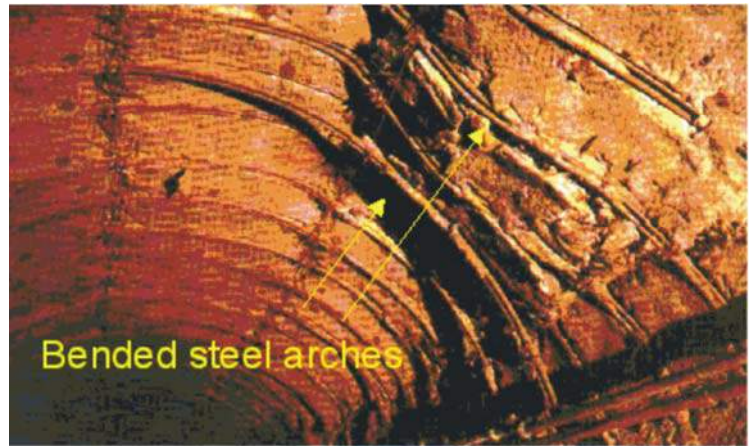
Bended steel arch sets. Arch sets are set in concrete. (after *Geologija in geotehnika, Predor Karavanke Tunnel, Ljubljana, 1991*)
